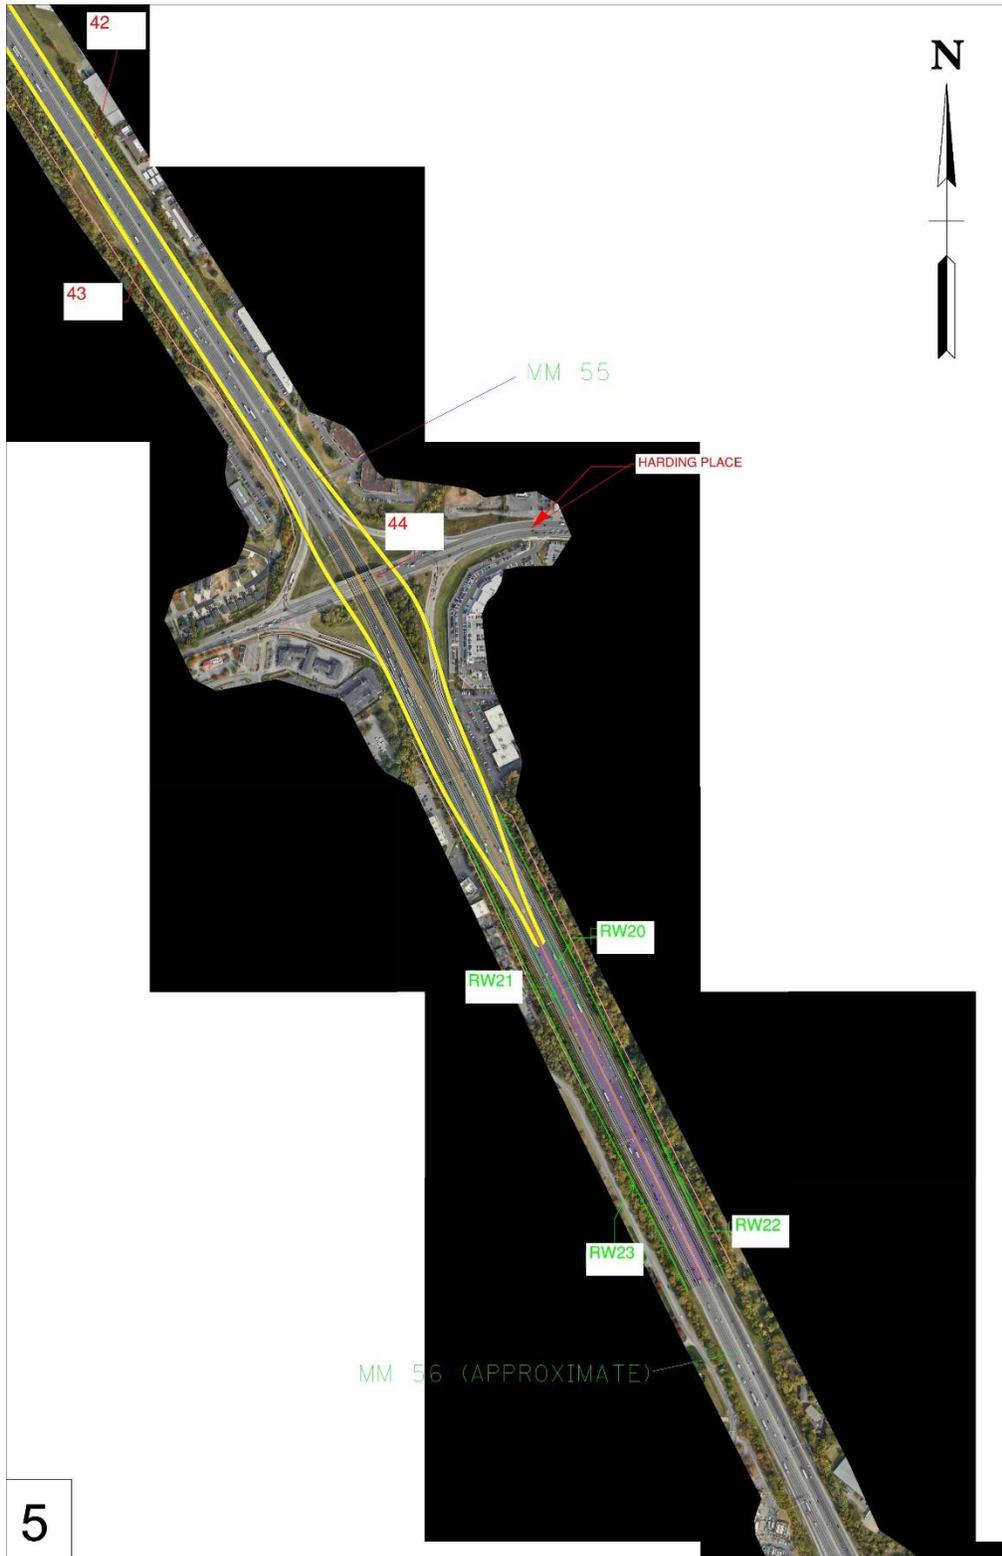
Alternative 2, Bridge and Retaining Wall Locations, East Thompson Ln to Antioch Pike
